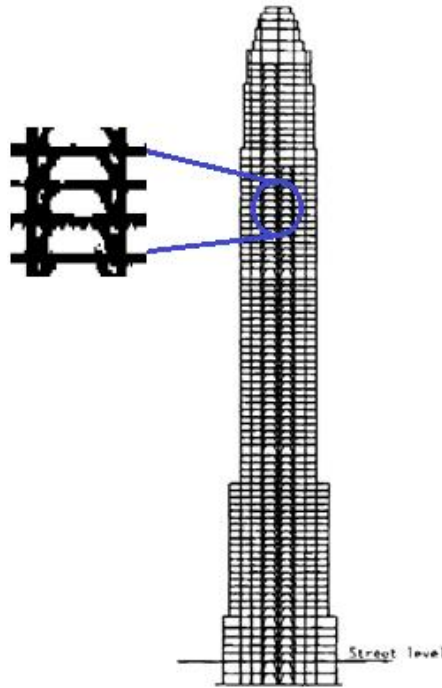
Application of Brace System in Empire State Building (adapted from [3])
